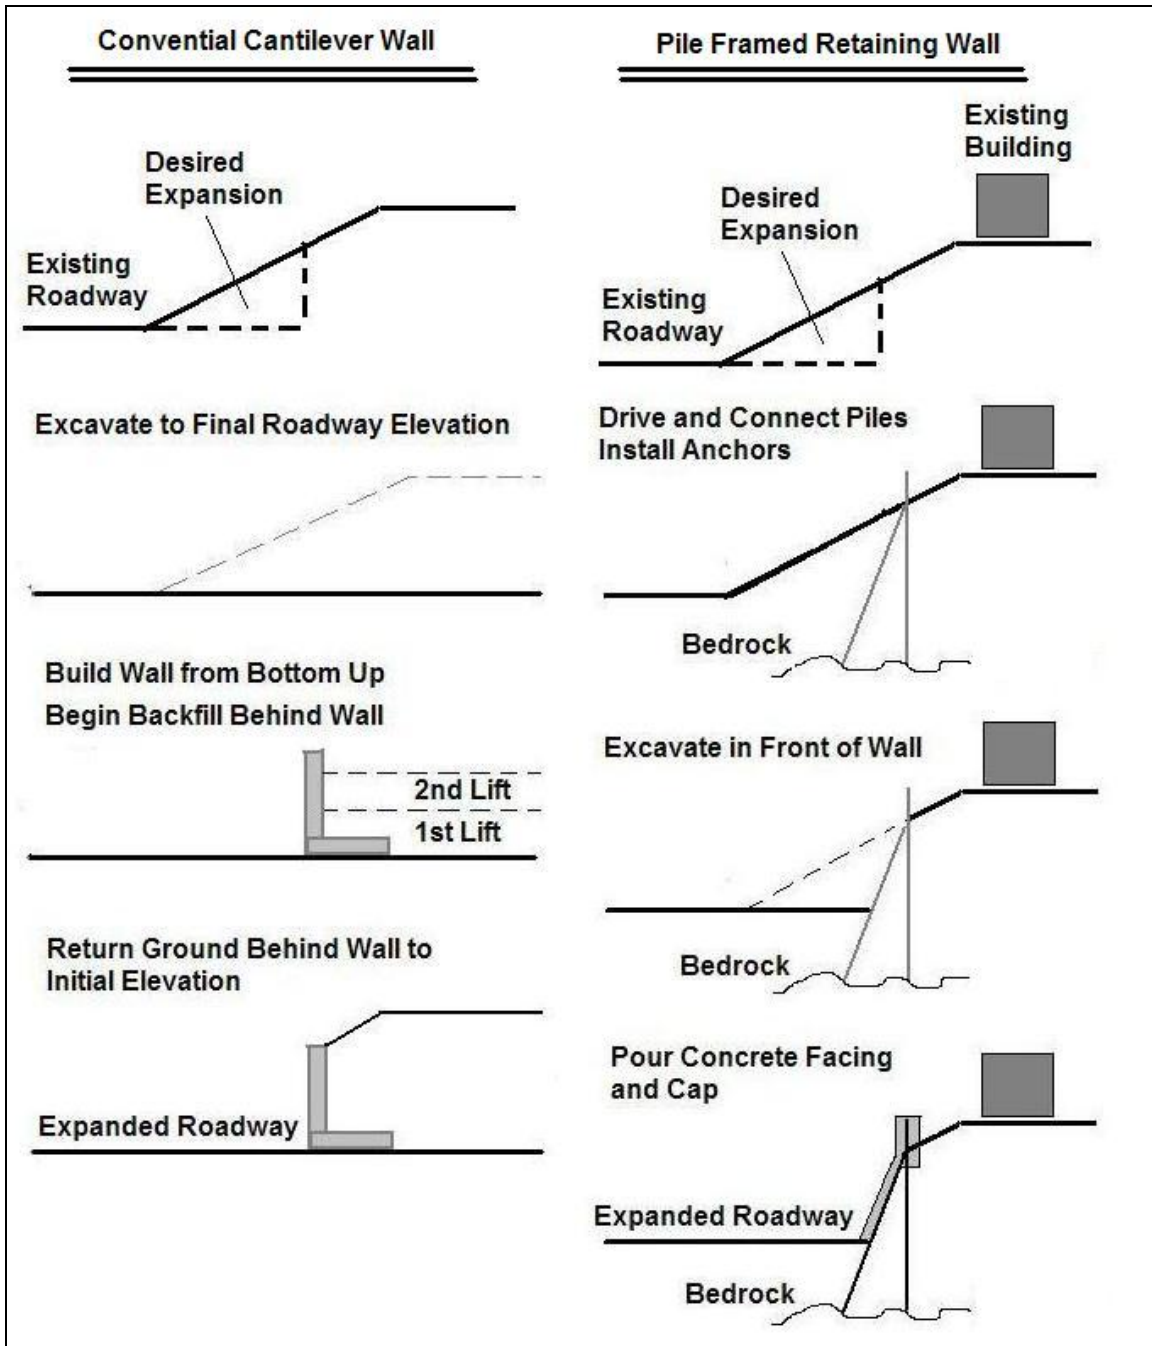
Conventional Cantilever vs. Pile Framed Wall Construction
